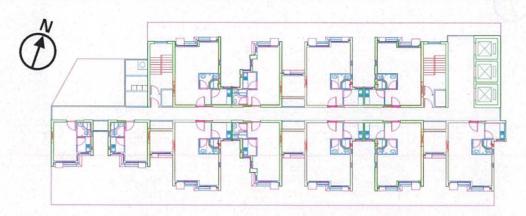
Typical Floor and Layout Plan of Enhanced PRH Scheme Phase 1
